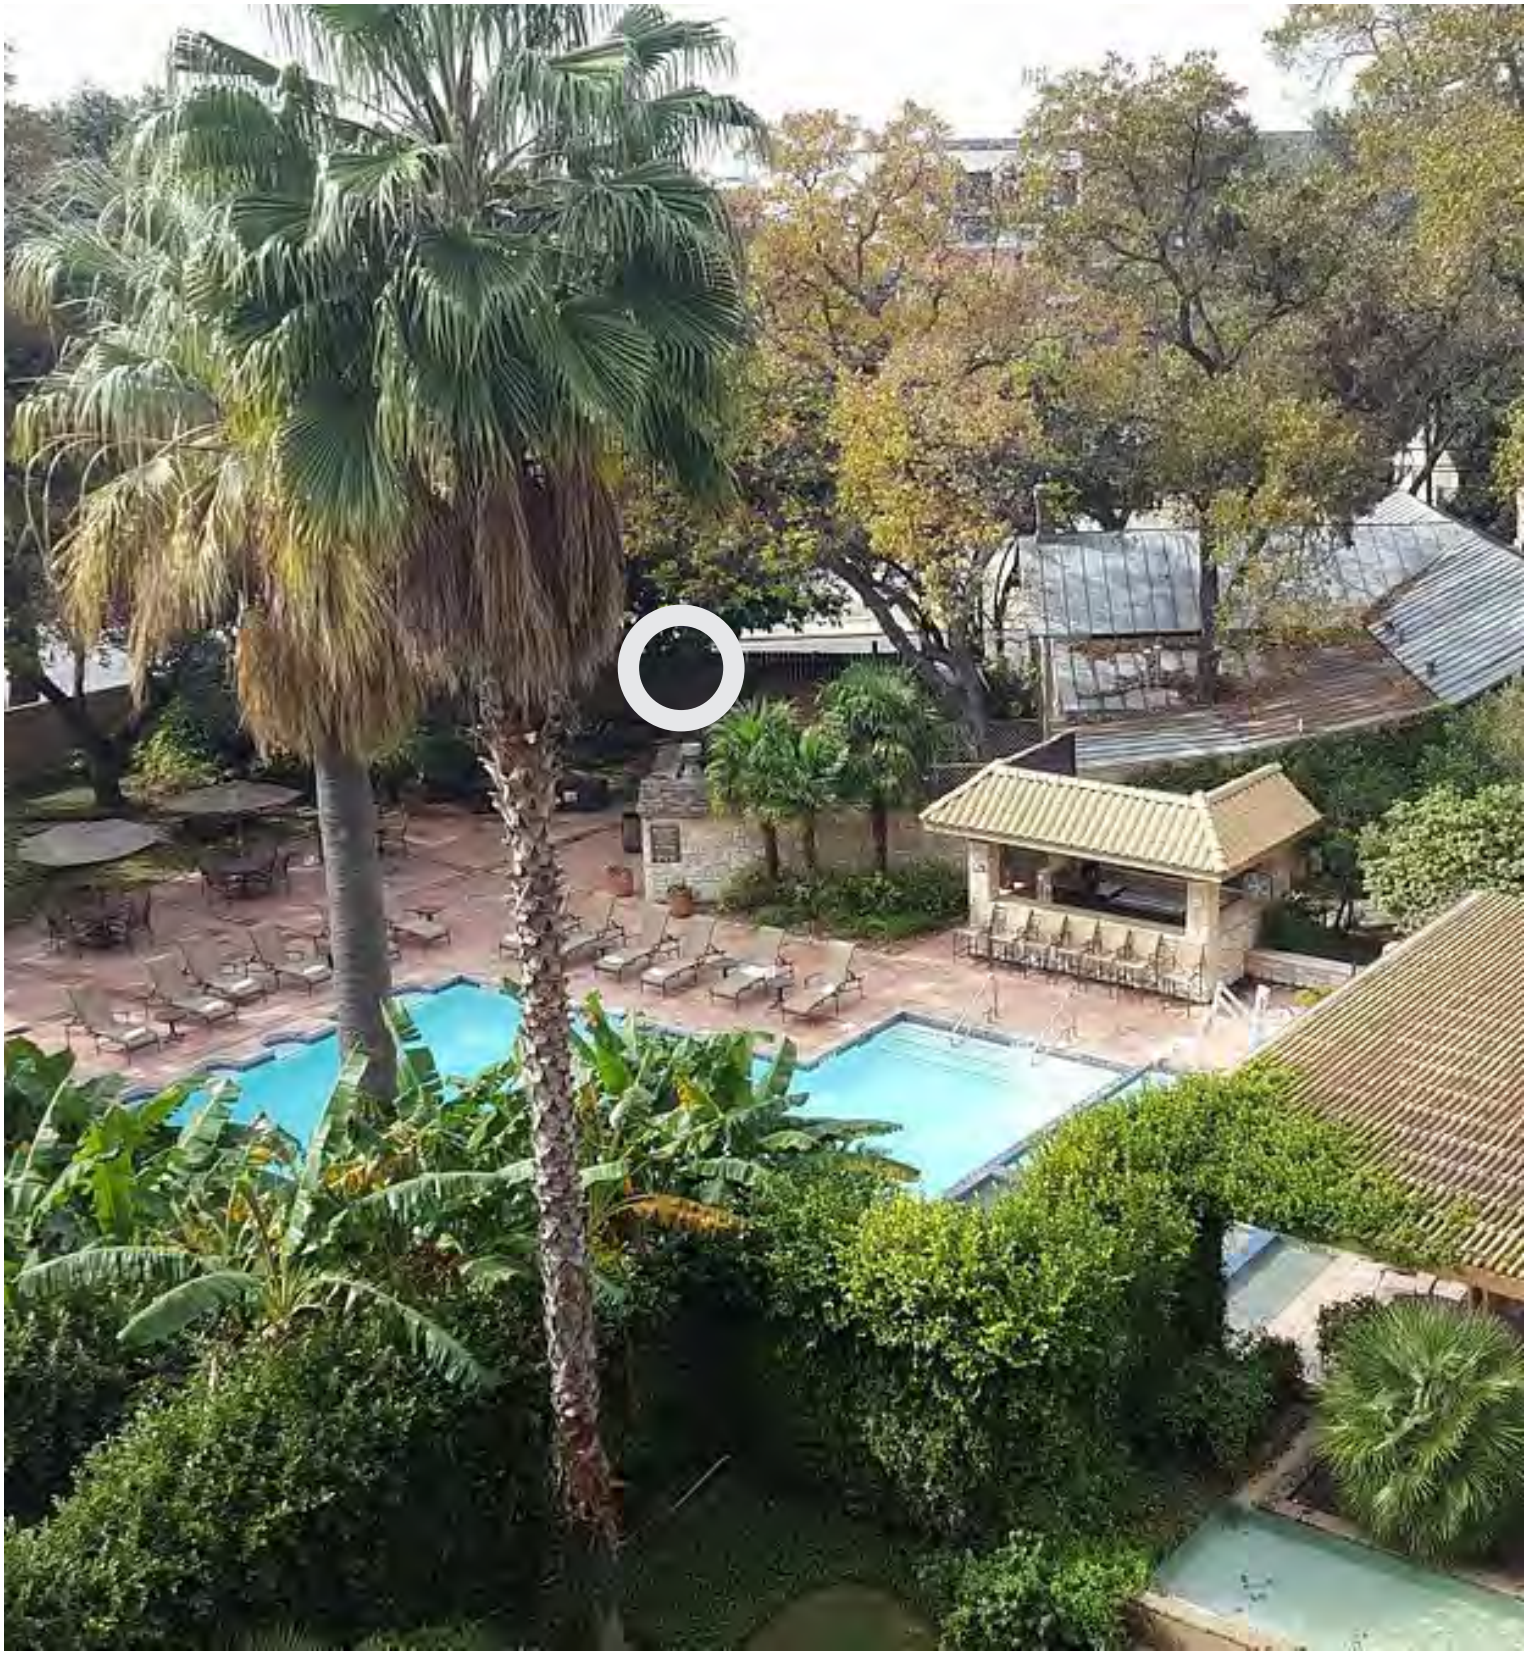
PHOTOS: EXISTING CONDITIONS AT NEW POOL BAR LOCATION
